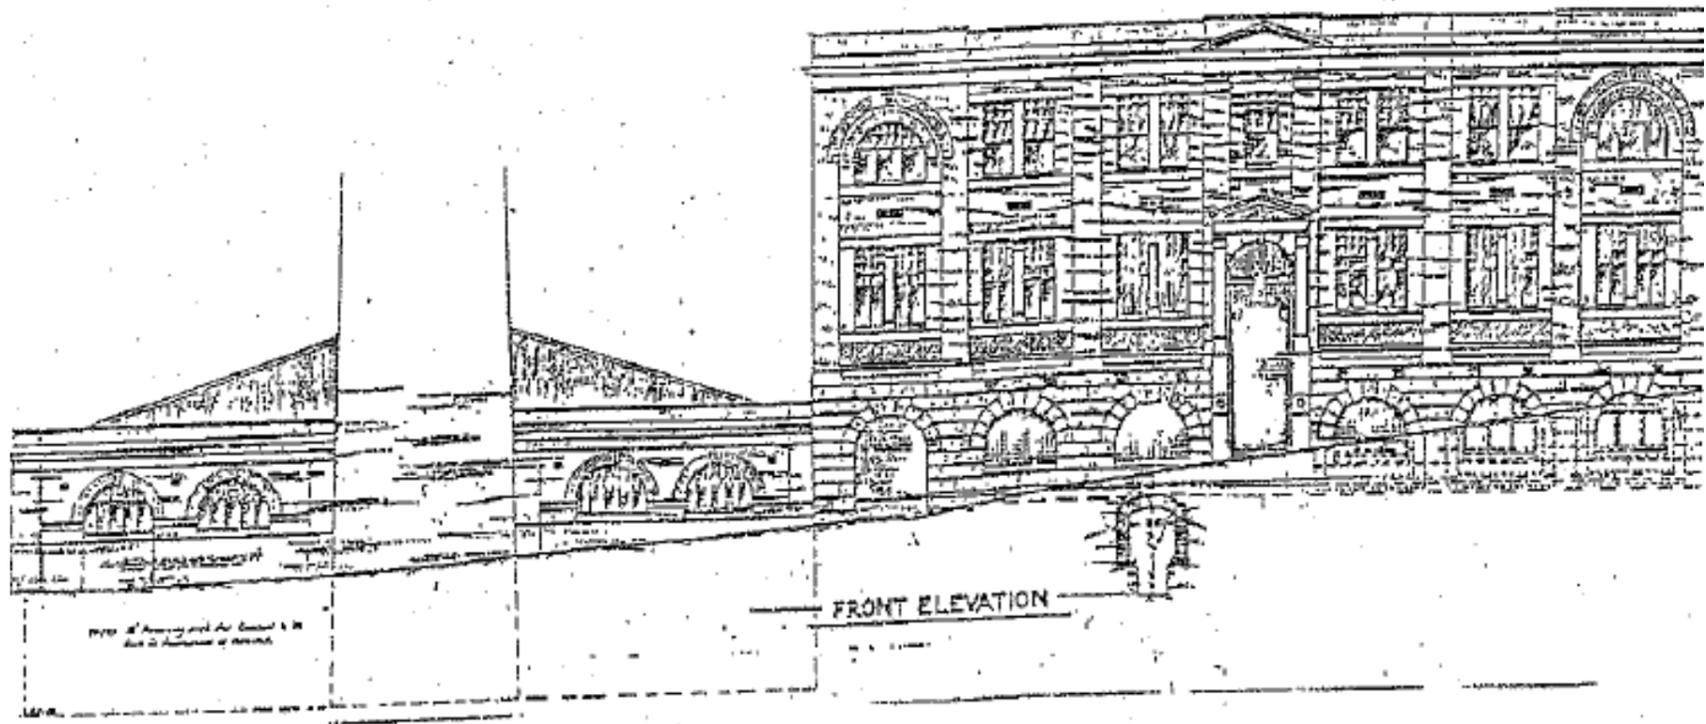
Top: Original north elevation of the old boiler house (Pump House) (left) and Office Building (right) (Source: NSWGT Contract No.12 Drawing No. 4 1898)
